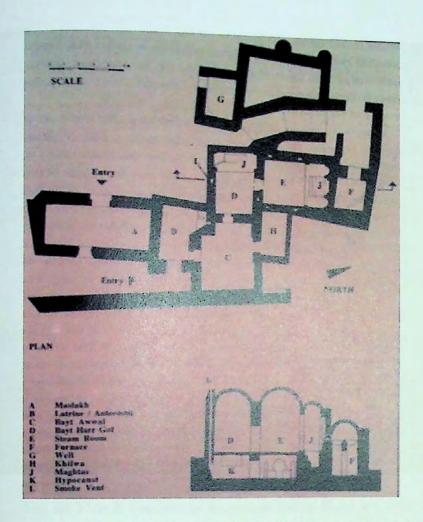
Plan and Section of the Tulunid Hammam. Source: A. Yasin, 1988.
